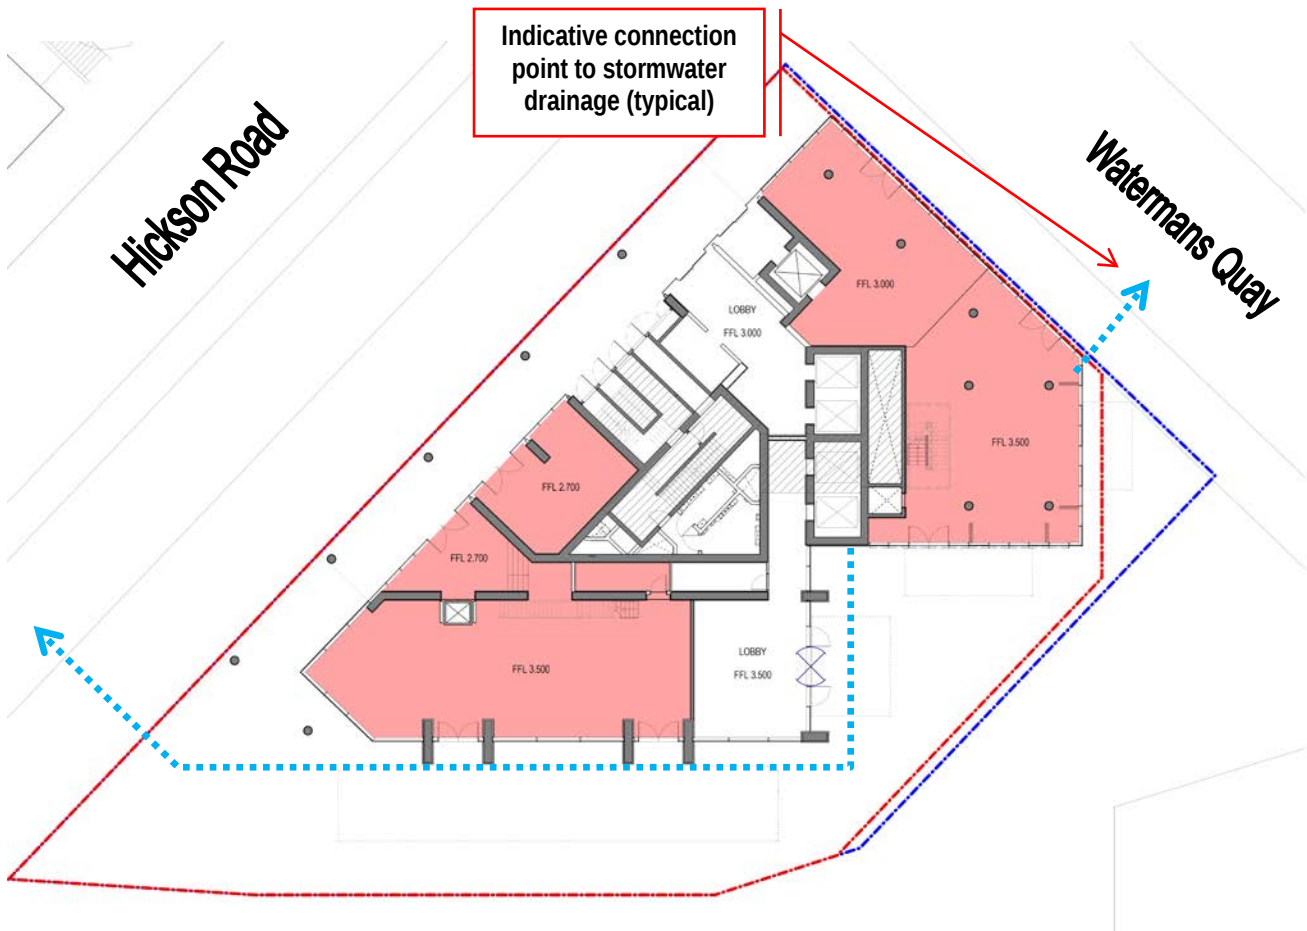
Indicative location of connections to Stage 1B internal and external drainage
